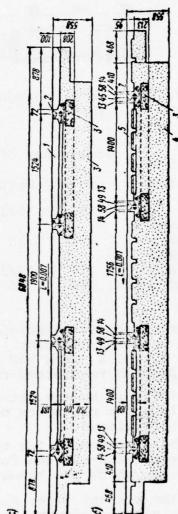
Tramway pavement: a--flat slabs; b--ribbed slabs; 1--flat slab of pavement; 2--frame tie; 3--rail; 4--ballast layer; 5--ribbed slab
